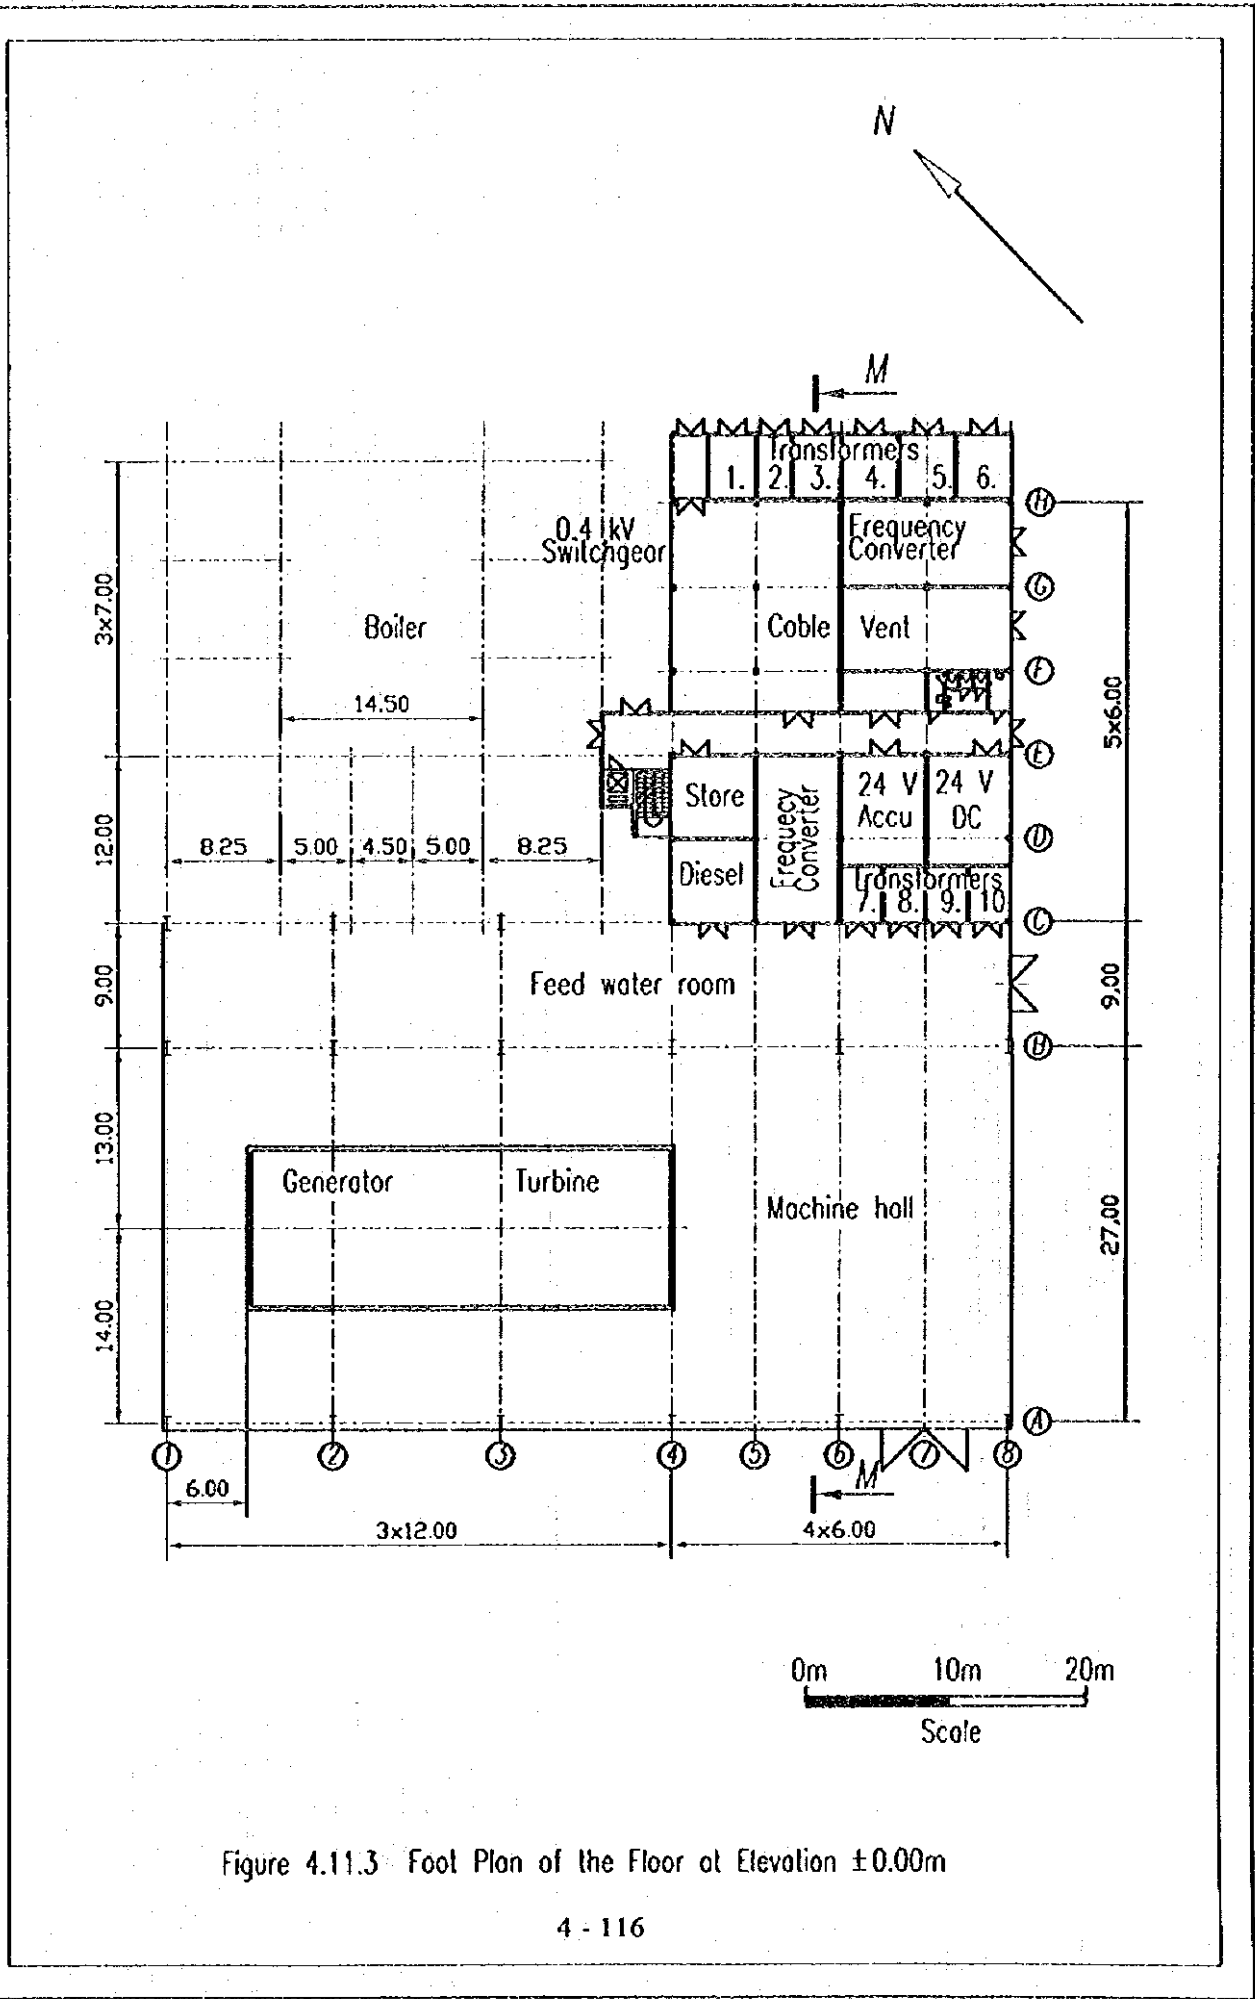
Foot Plan of the Floor at Elevation ±0.00m
